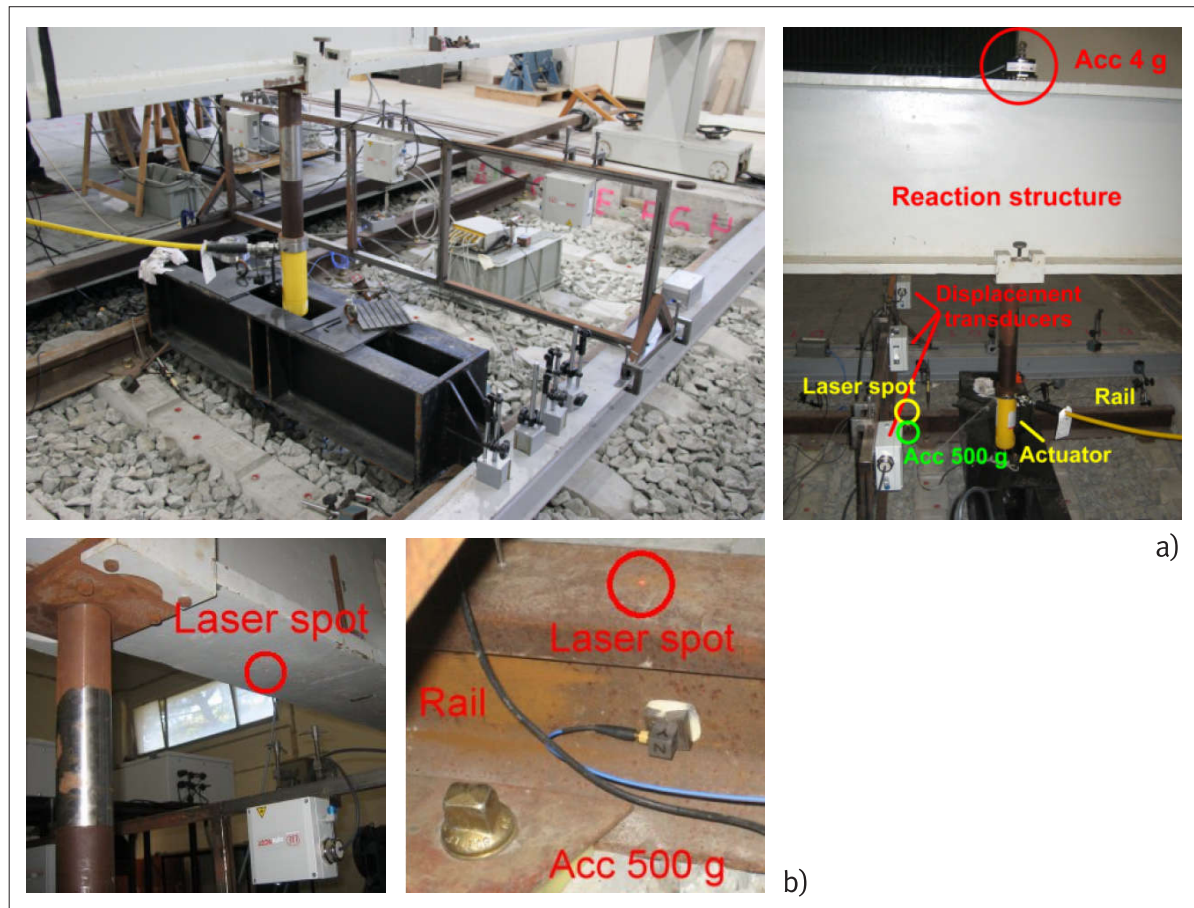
Cyclic load test: a) Cyclic loading apparatus, b) details of the instrumentation
